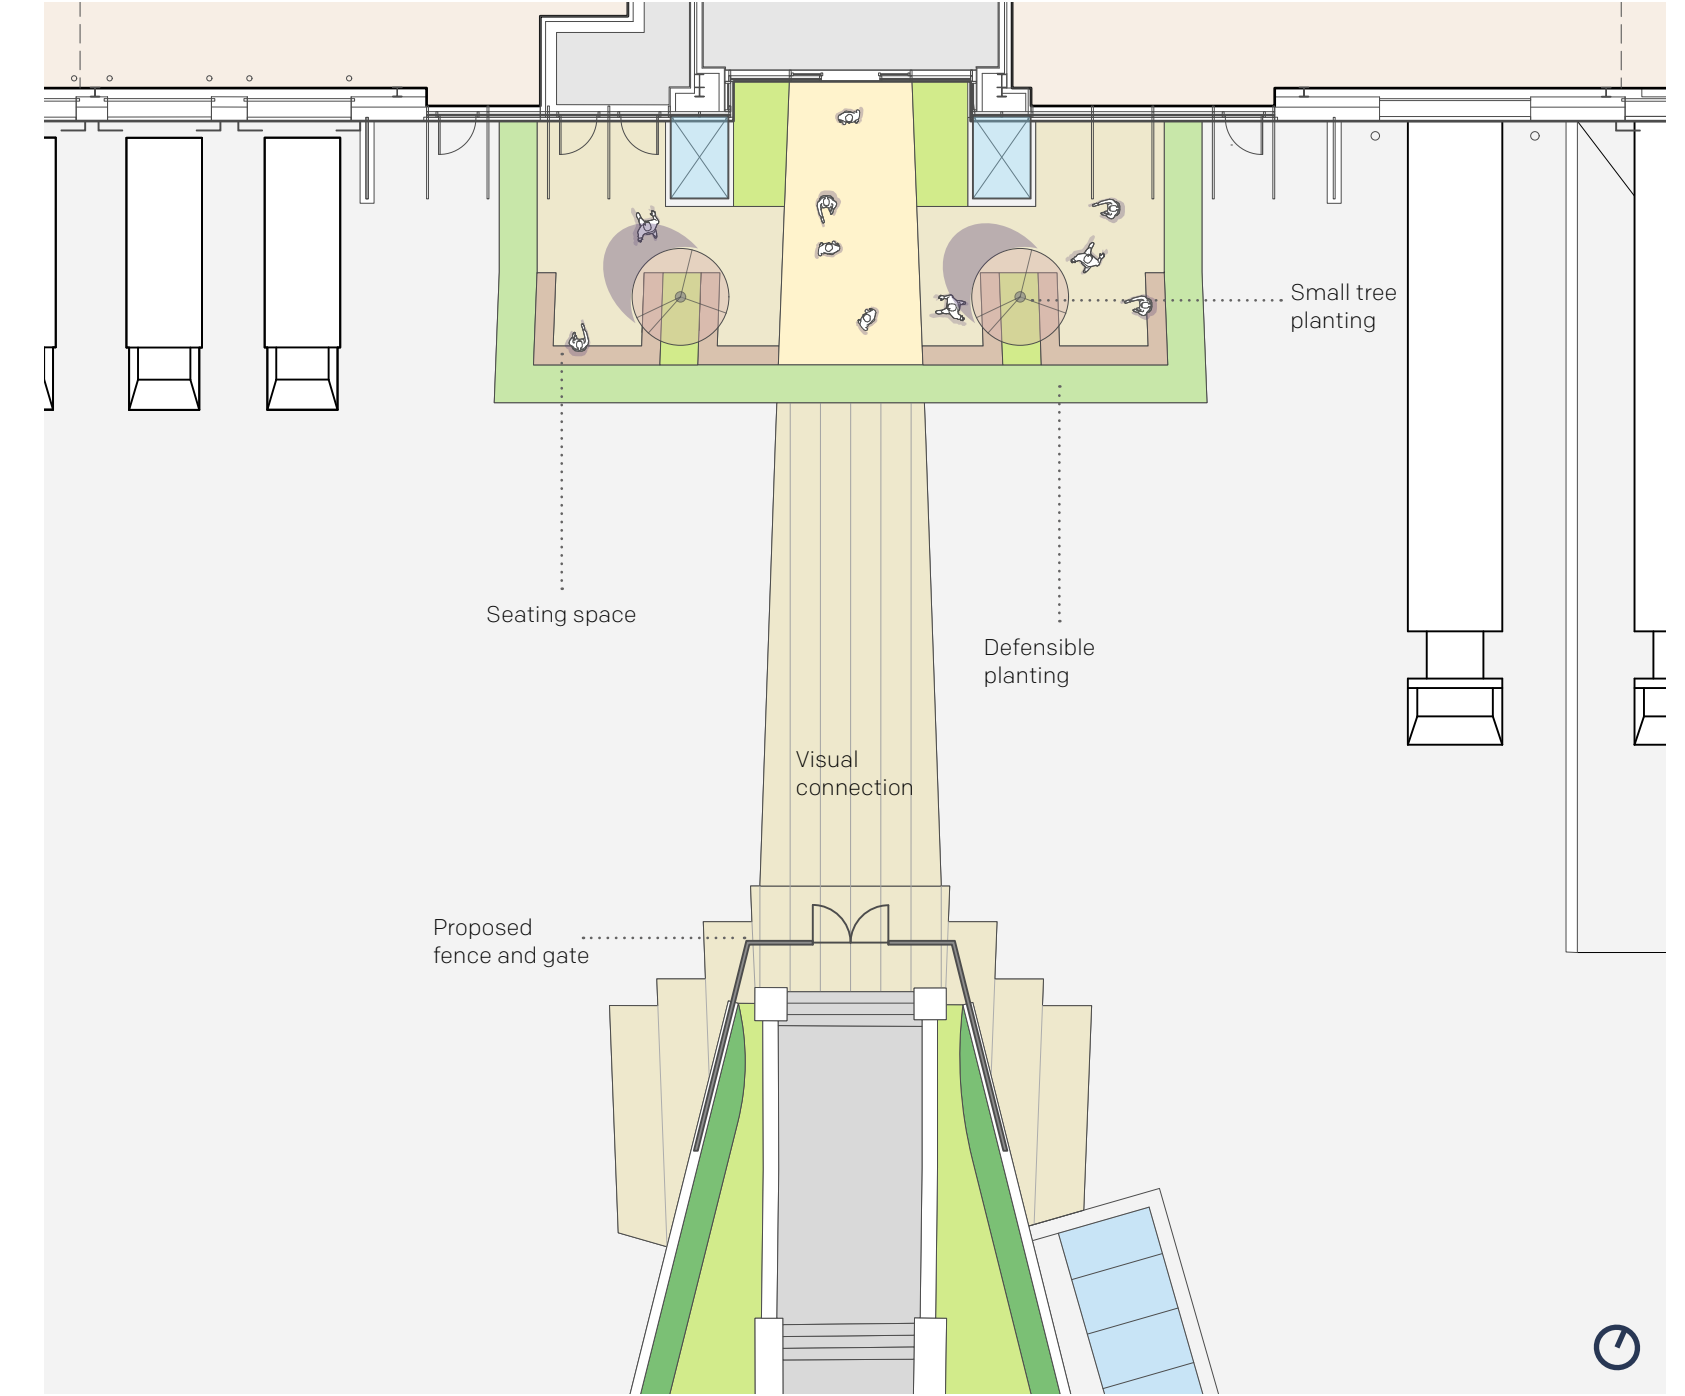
Entrance Outdoor Amenity Space Plan View NTS
